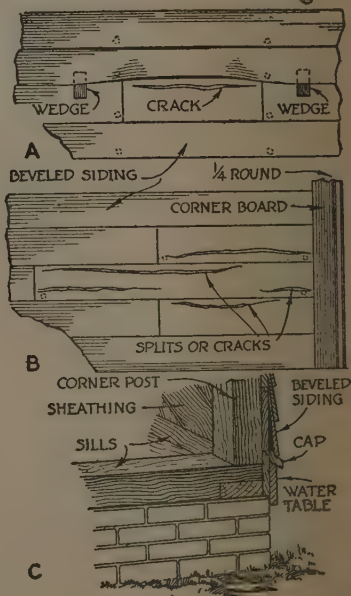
How cracked or split pieces of beveled siding on the wall of a house are cut out and replaced. Unless these repairs are made promptly, the corner post and main sill may rot away.
